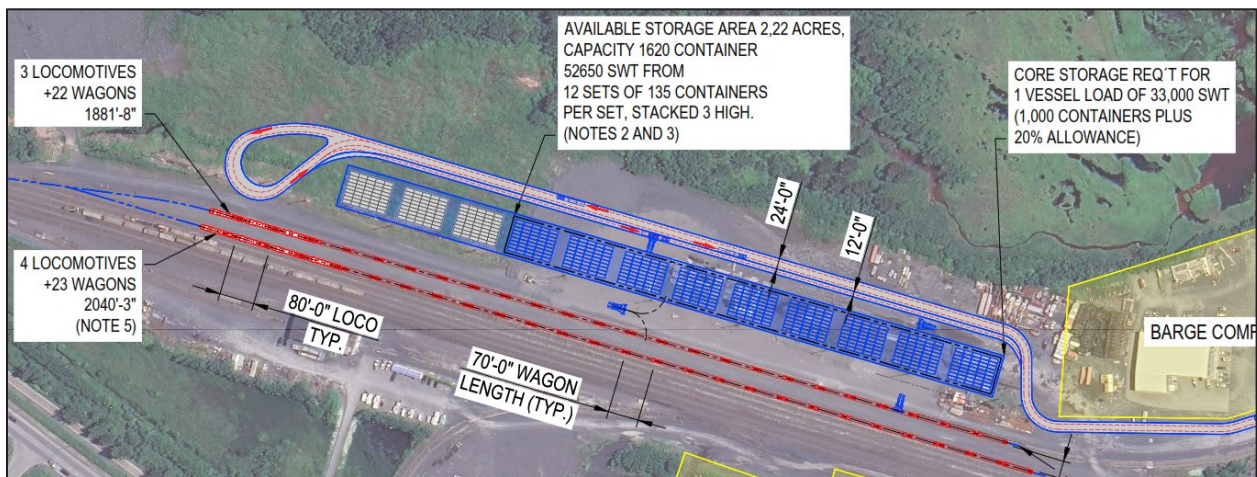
Seward Proposed Site Plan: Storage Area Detail
